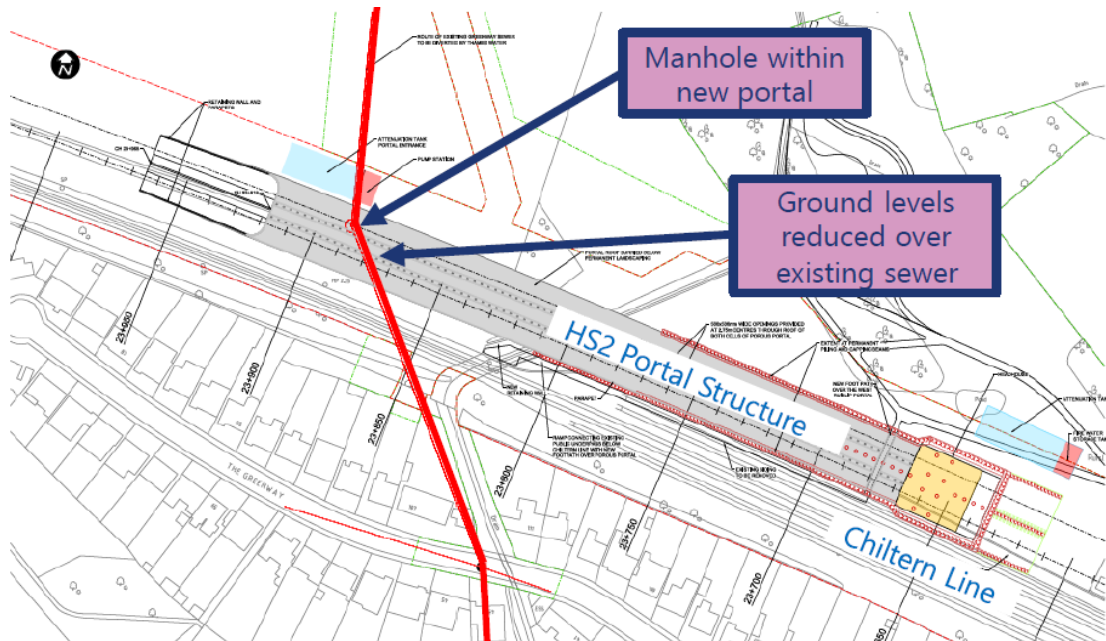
Plan of existing sewer under the Chiltern Line and HS2 portal structure
